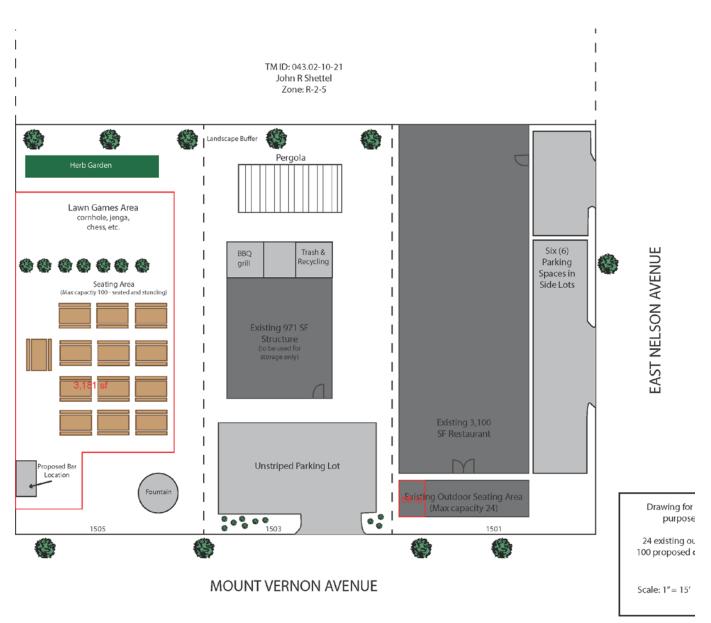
The applicant's outdoor dining proposal. The bulk of the outdoor dining is proposed on the lot at 1505 Mount Vernon Avenue, where the outdoor bar and lawn games would be. The applicant proposes to use the existing building at 1503 Mount Vernon Avenue as storage and is exploring using the building for additional bathrooms.
